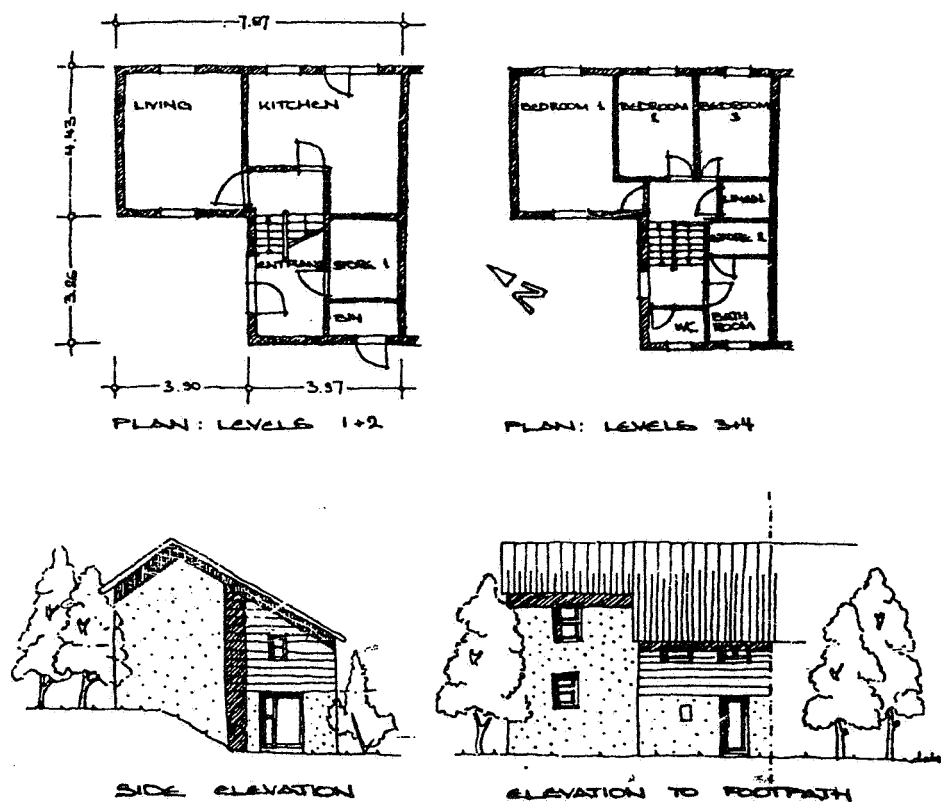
HOUSE PLANS AND ELEVATIONS
